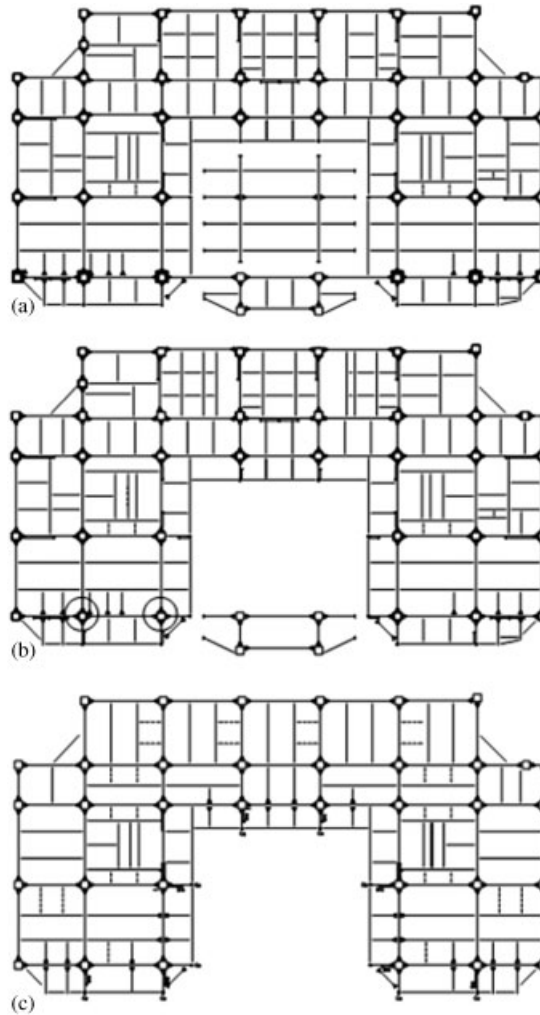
Typical floor framing plan of the building: (a) 1st to 11th stories; (b) 12th to 25th stories; and (c) 26th to 34th stories.
